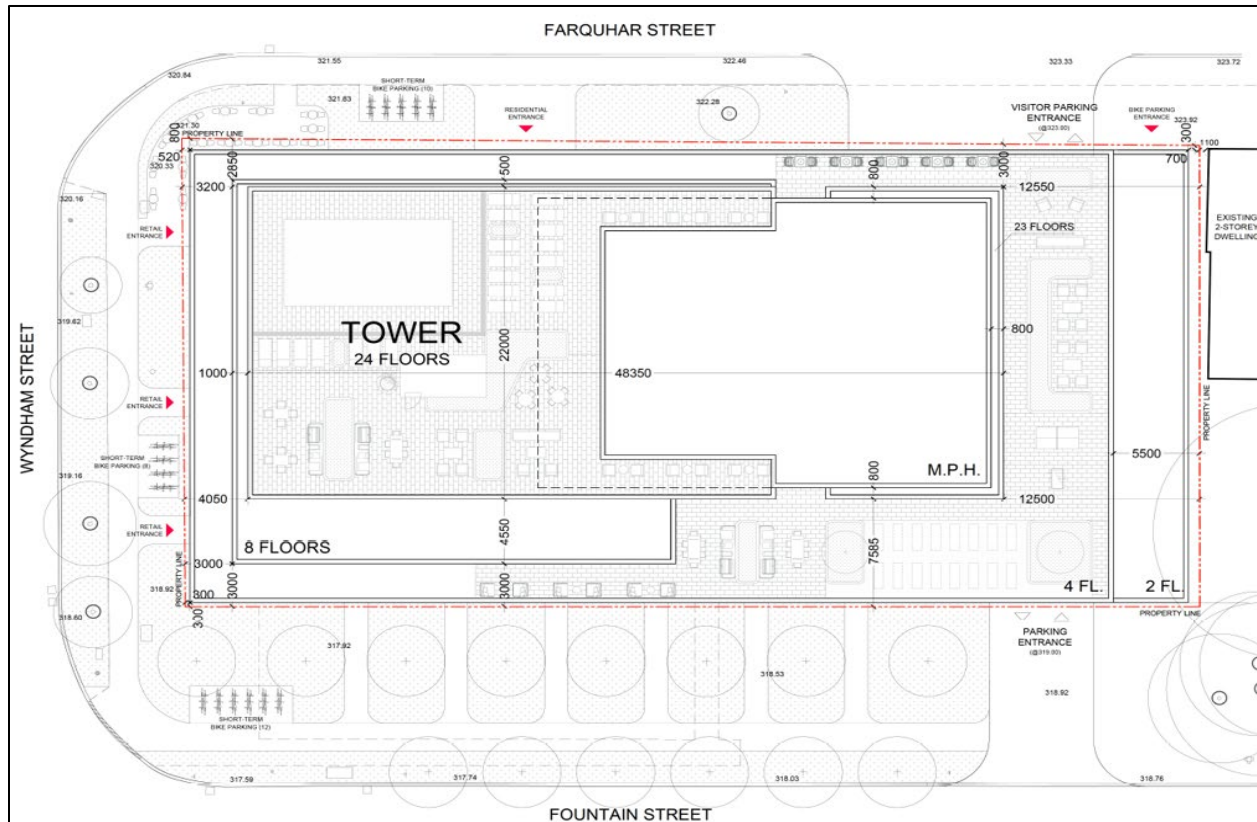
Site Plan (Source: Hariri Pontarini Architects)
